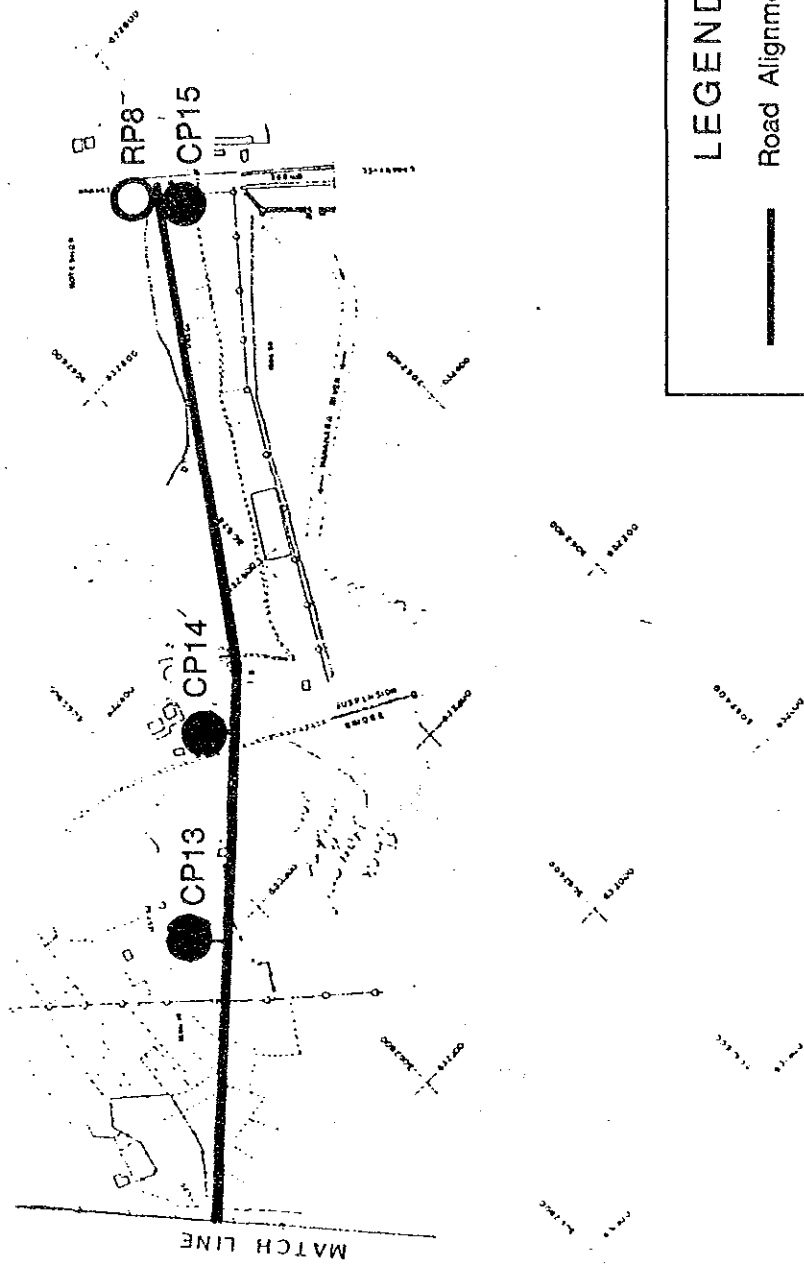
LOCATION OF ROAD PITS (6/8)
